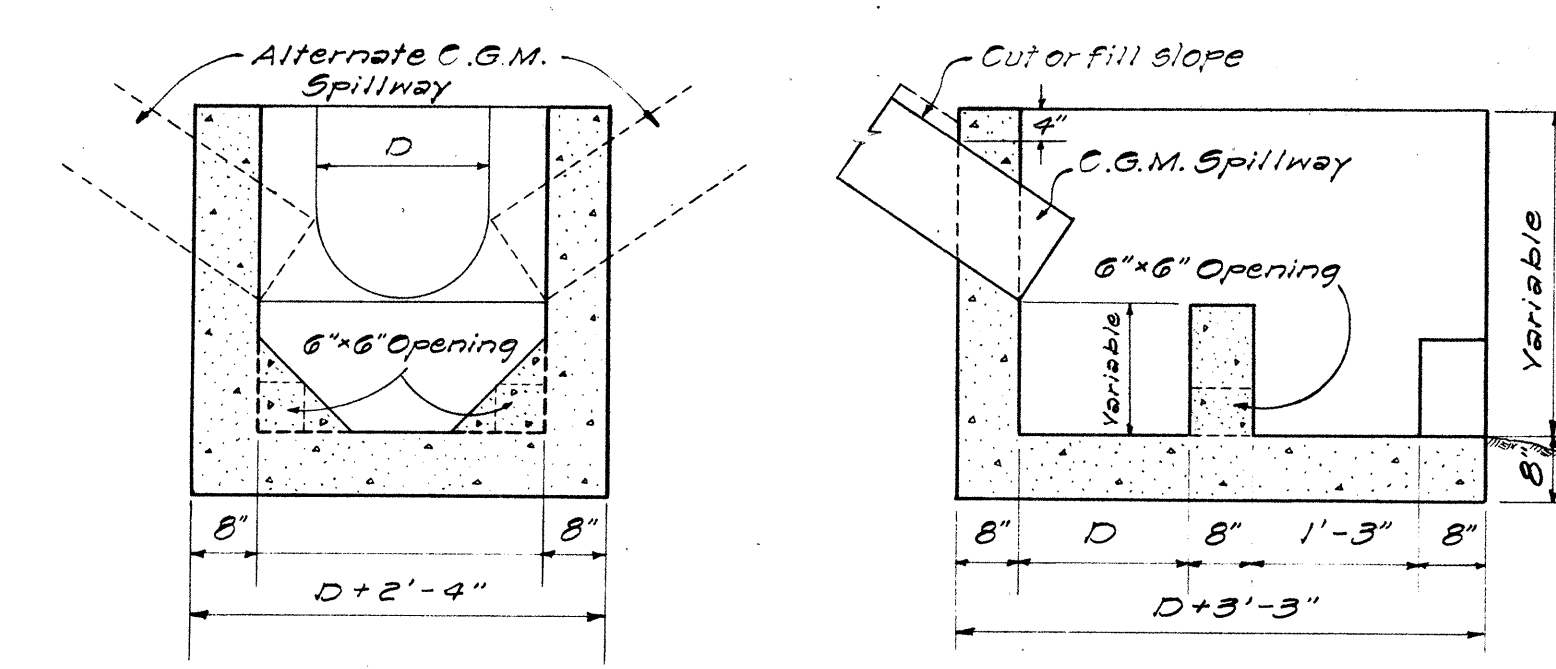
DETAIL OF CULVERT TO SPILLWAY CONNECTION
